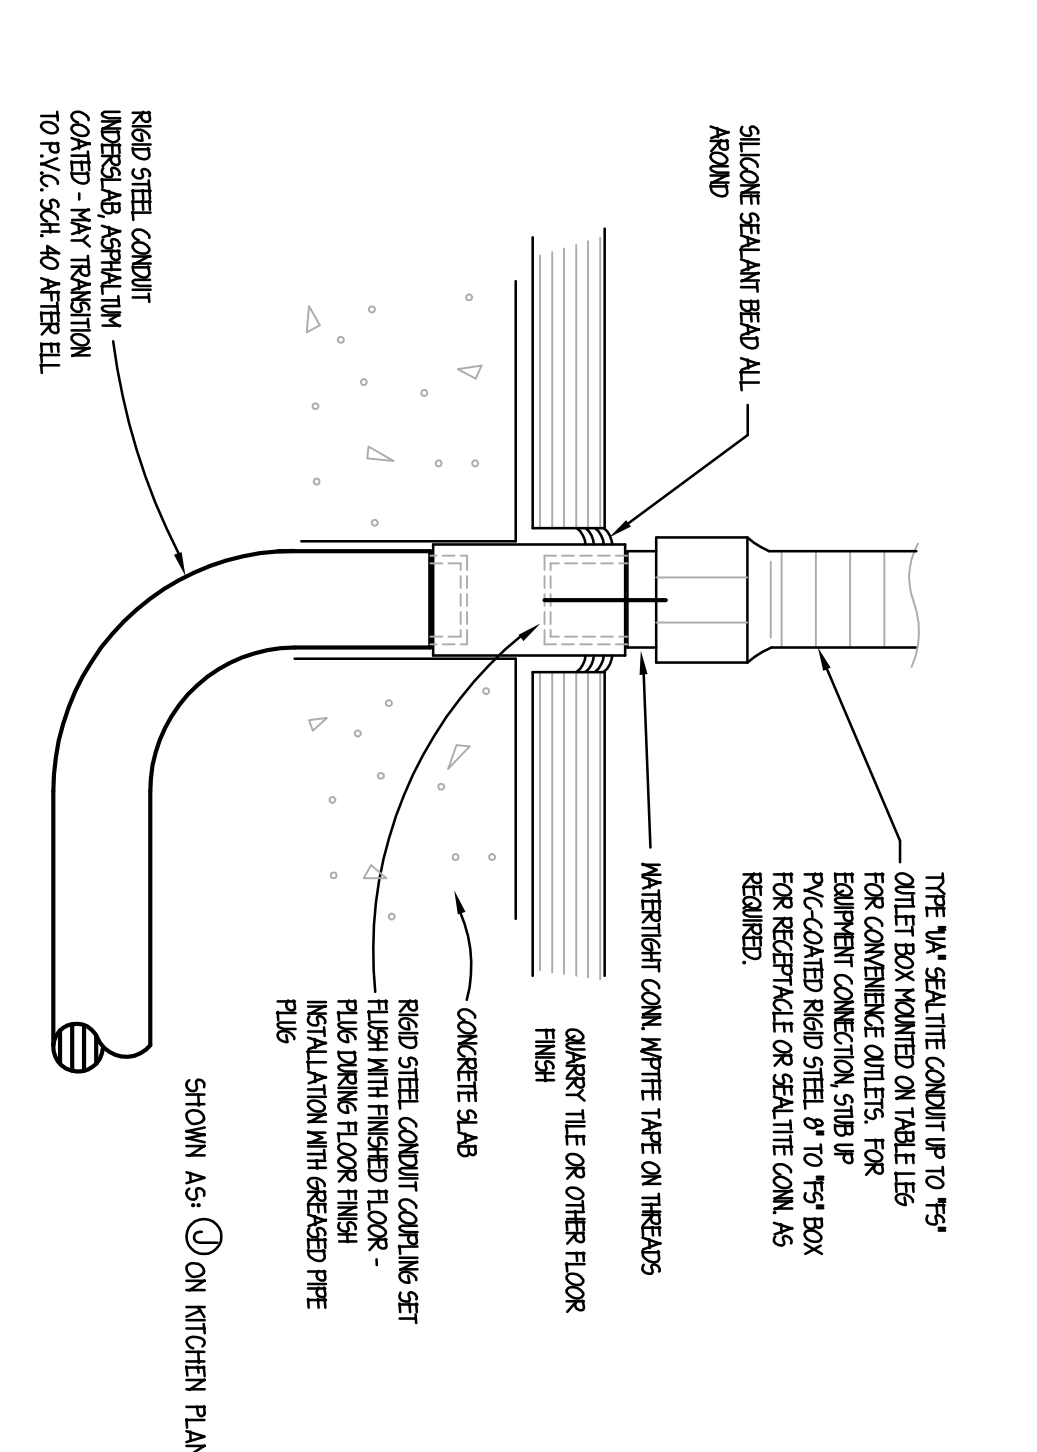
DETAIL OF TYPICAL HARD-WIRED CONNECTION
